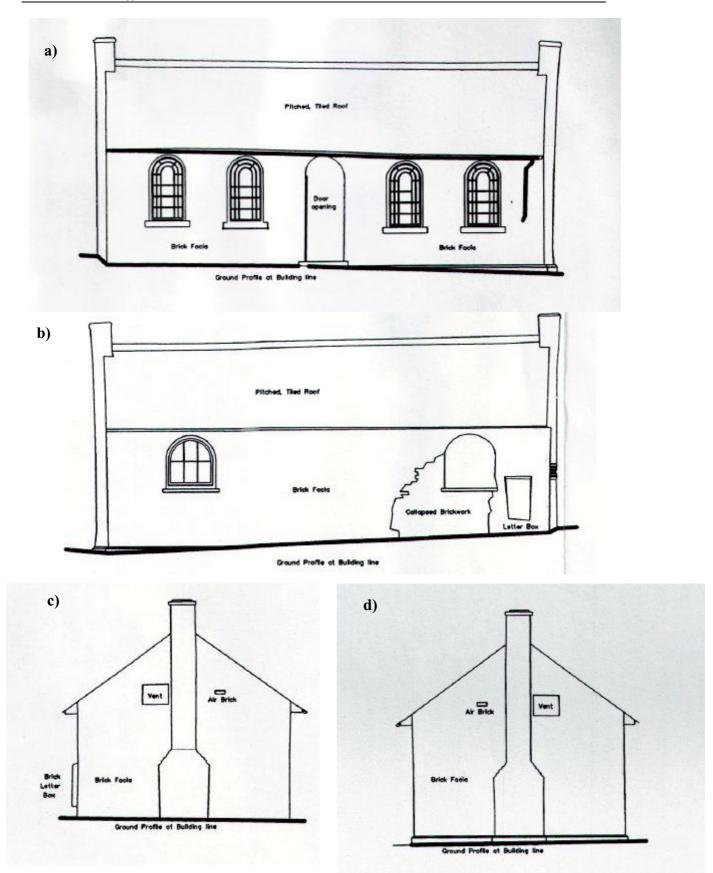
Building elevations, scale 1:100. a) east-facing b) west-facing c) south-facing d) north-facing elevation. (as surveyed by Simic Associates, drawing no. 11557:04c)
